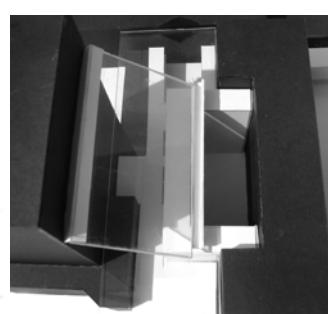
A Glazed roof spans across the site, providing protection against the elements, while allowing natural light. (Photo by author).
